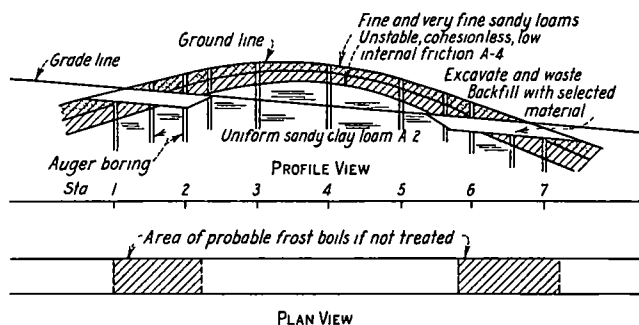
Excavation and Backfilling Provided Where Soil Survey Preceding Grading Reveals Inferior Soils
